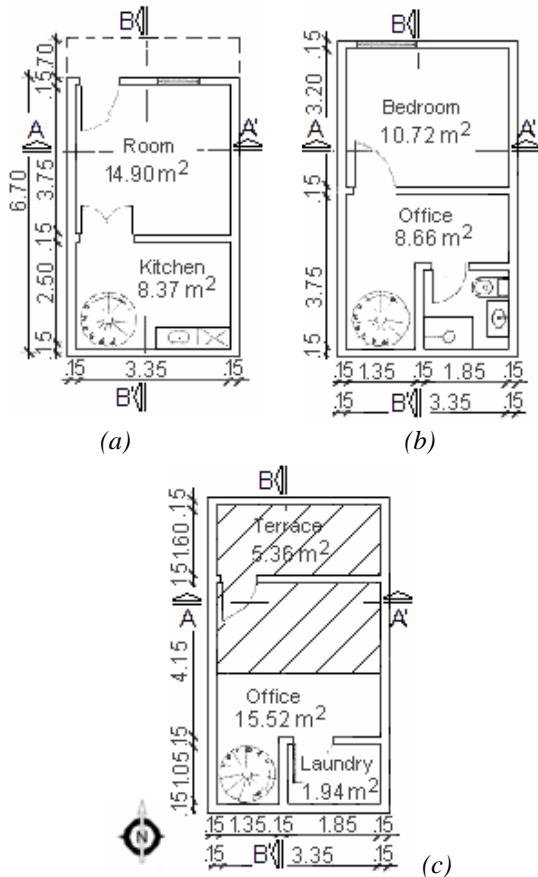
Plans of the three floors; first-floor (a), second-floor (b) and third-floor (c).
